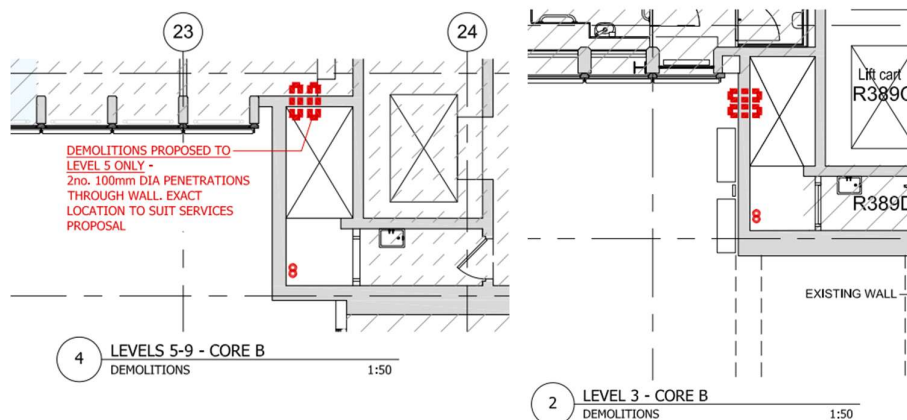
Floor plan showing the wall penetrations at Level 5 and Level 3 (Source: Architon LLP)
